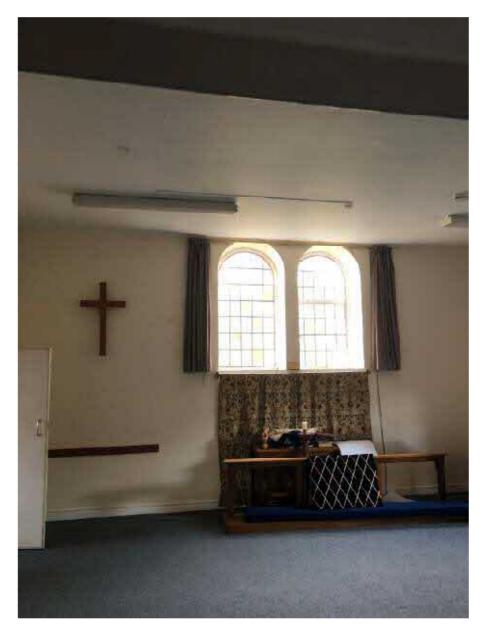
South elevation windows as seen from inside the church, showing false ceiling.
